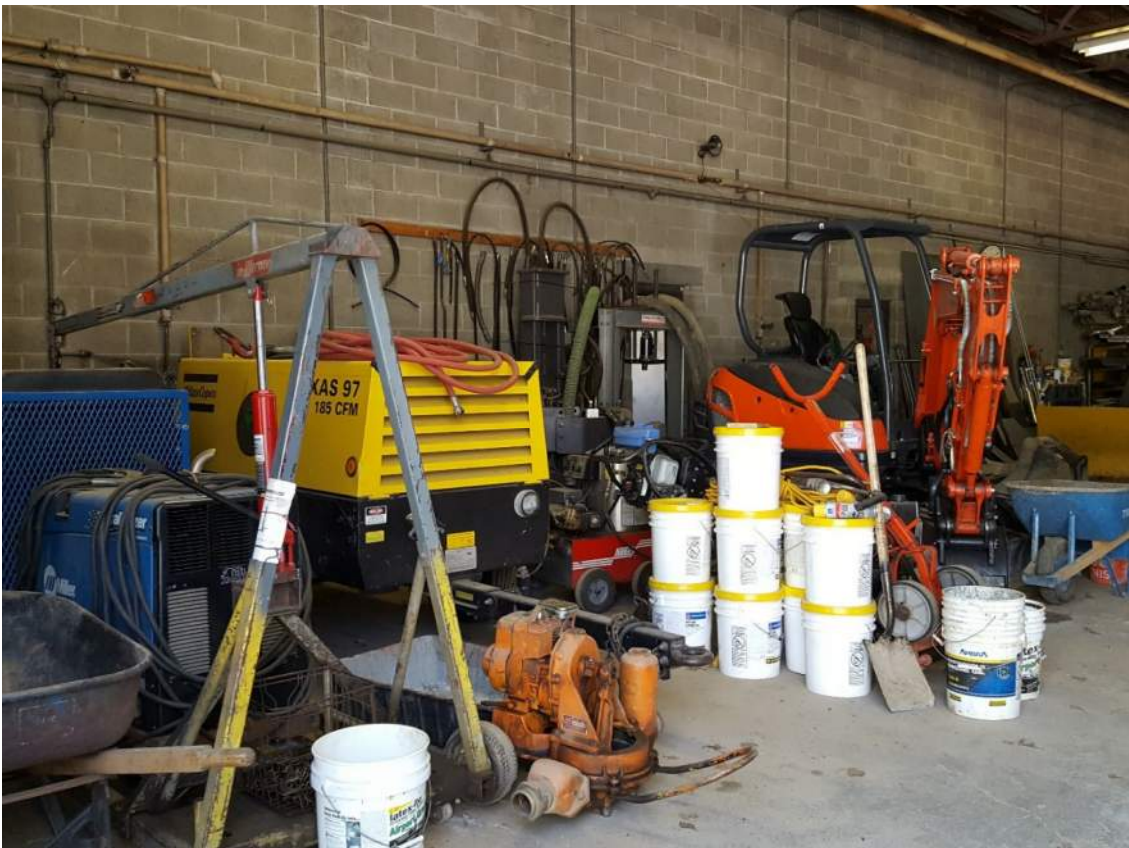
Equipment and supplies are organized along the east wall of the garage.
